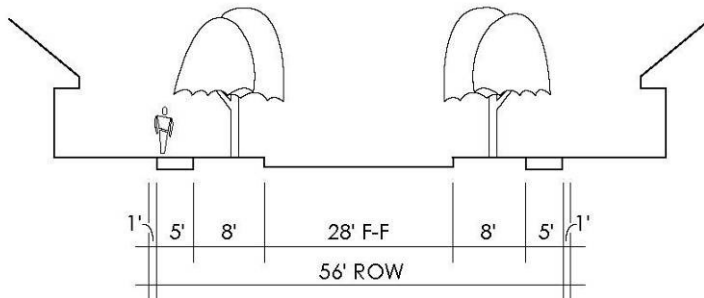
Schematic sketch of a typical minor street cross-section with two-sided parking.
